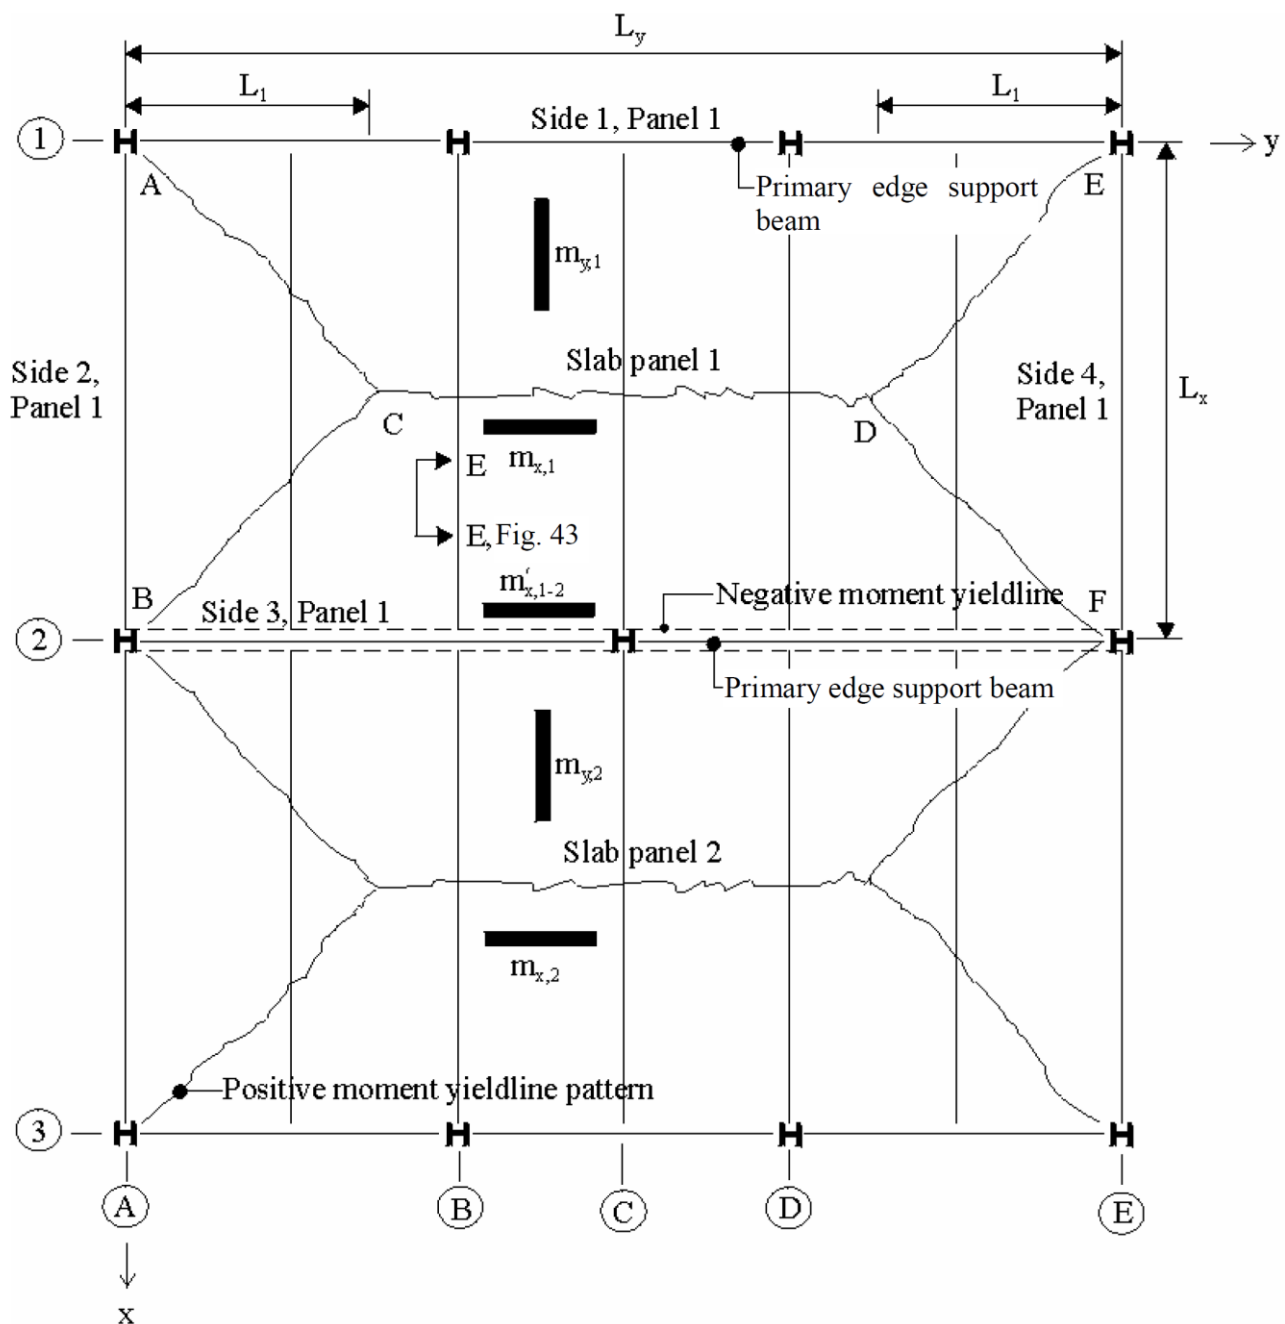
Plan view of a composite floor divided into rectangular slab panels (Clifton, 2006)
